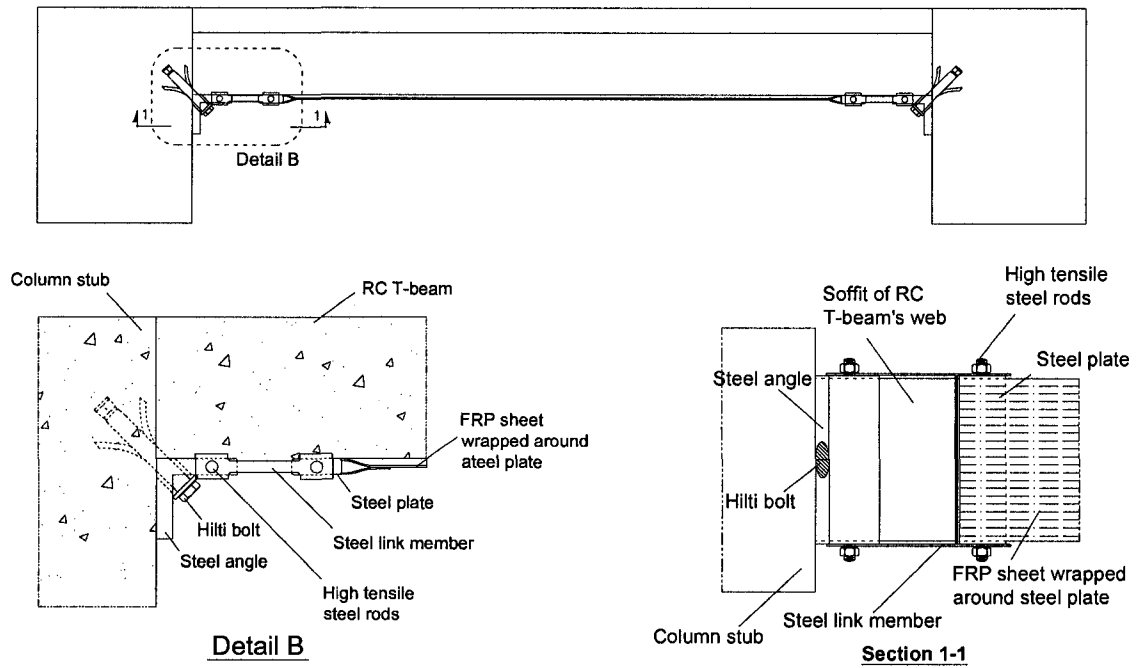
Proposed Hybrid FRP / ductile steel anchor system
